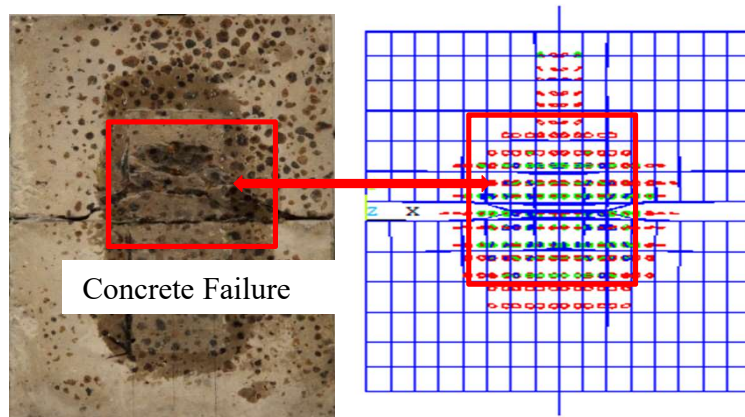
Crack patterns at the failure of BL1-2 specimen.
